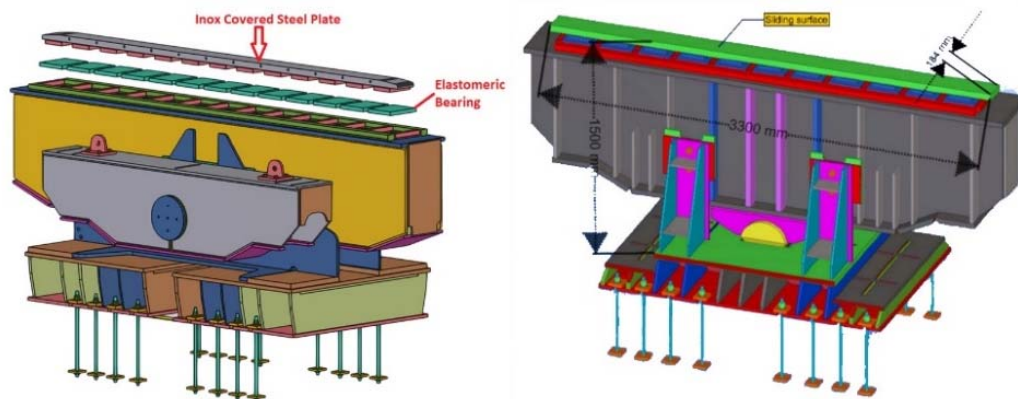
Sliding Bearings: a) adjustable; b) fixed
